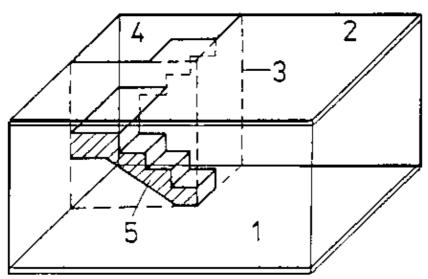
Representation of the stairwell – 1 lower floor–ceiling, 2 upper floor–ceiling, 3 stairwell, 4 opening in the upper floor–ceiling, 5 stairs with half–landing to be built in
